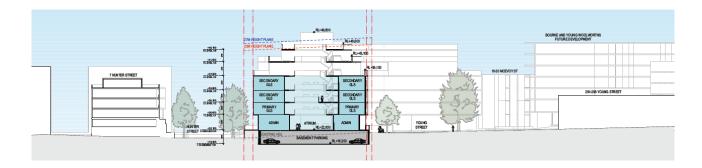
West-east cross section of indicative building envelope. Source: Plus Architecture Urban Design Report
